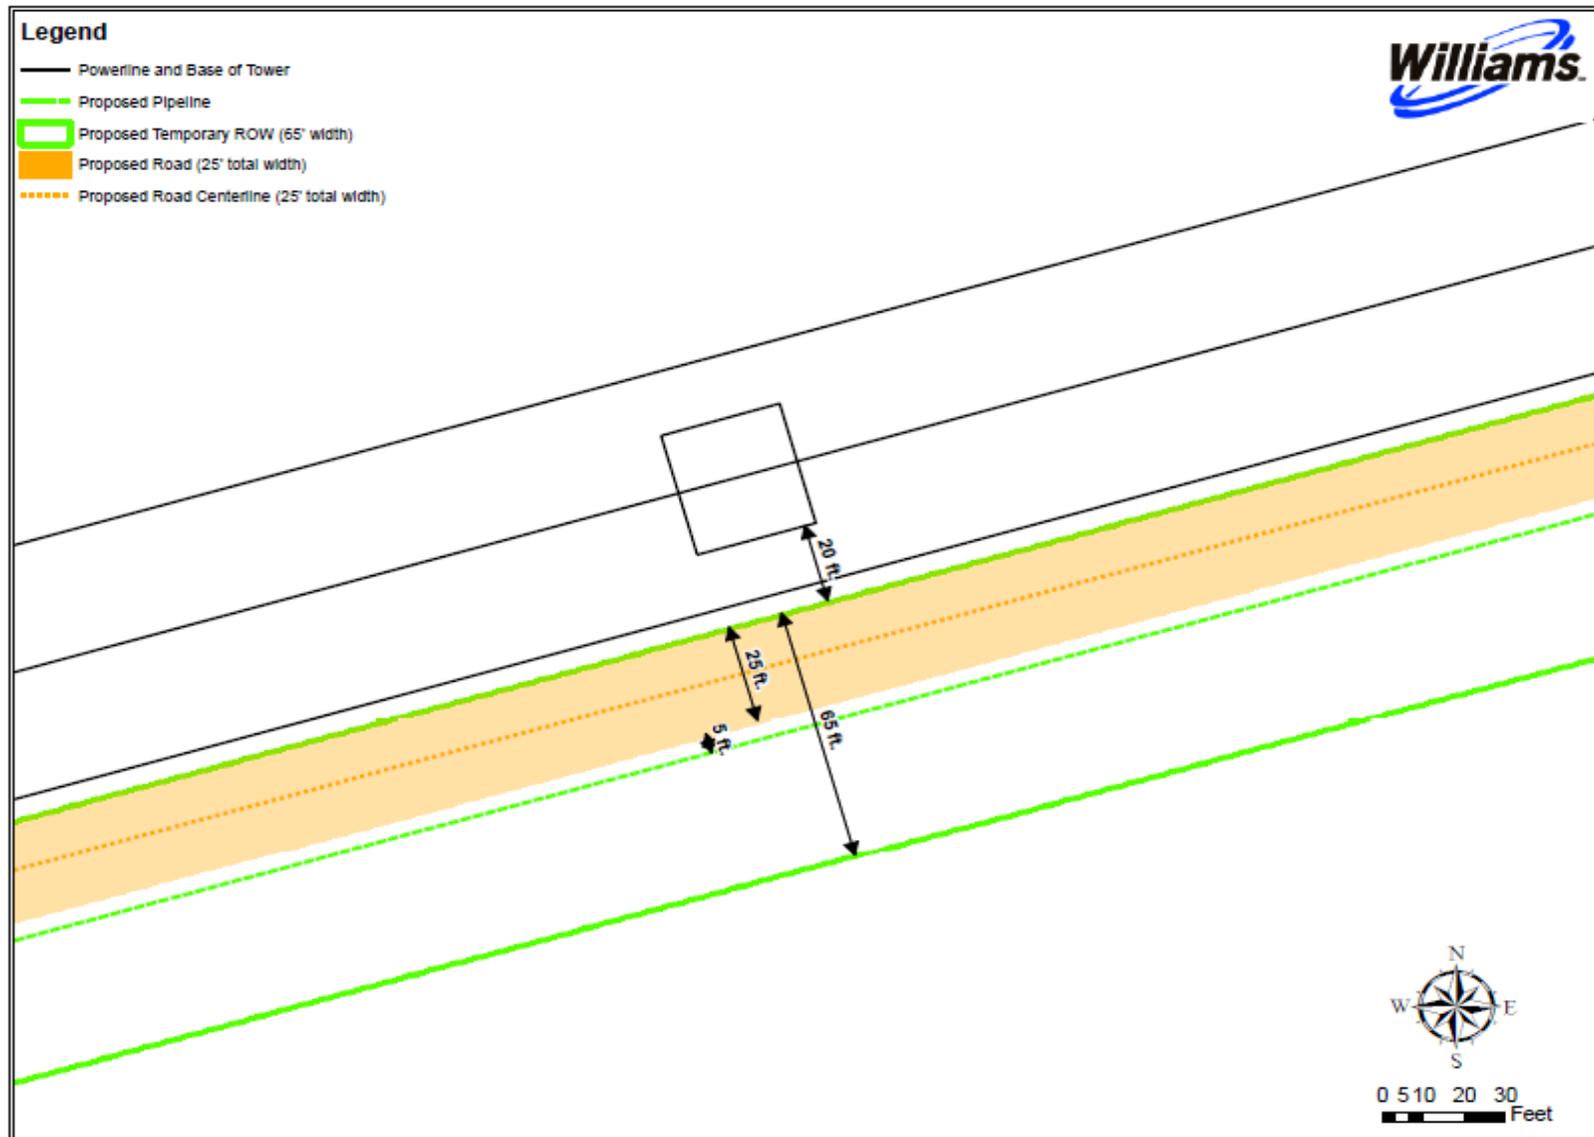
Construction Setbacks from PSCo Transmission Line Towers (#25 to #27) for RU 23-5 Road (tan) and Pipeline (green)
